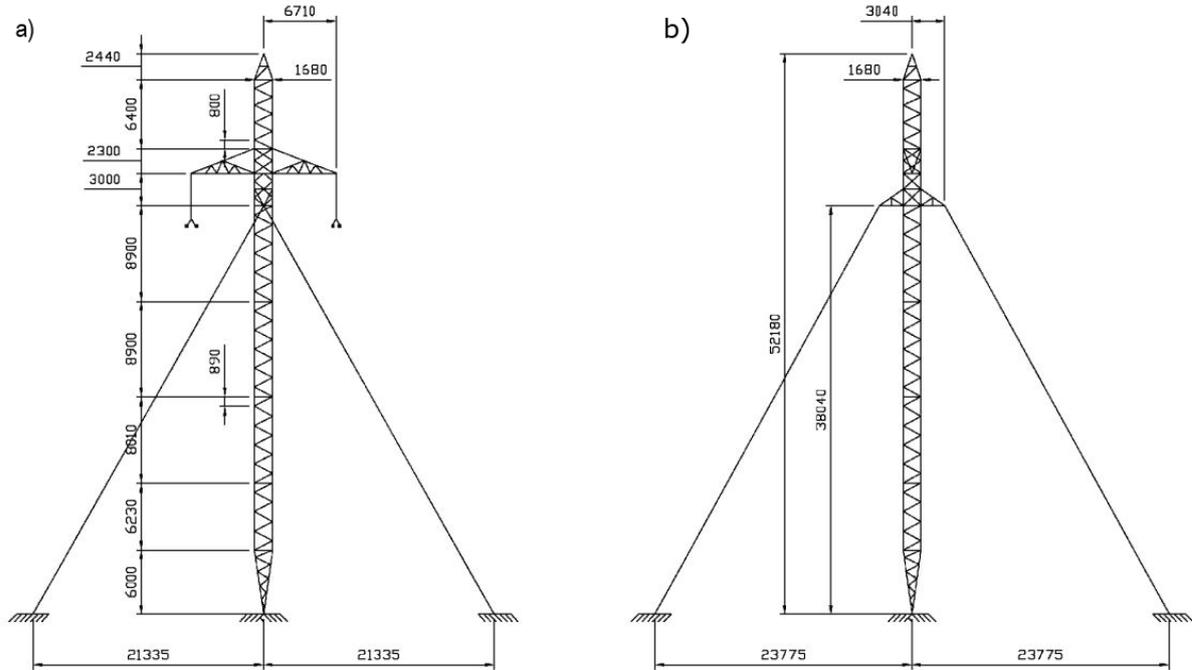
Tower model: a) transverse view; b) longitudinal view. All dimensions in millimeters.
